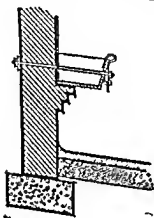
Section showing a wooden manger with corbel and its bolt.
